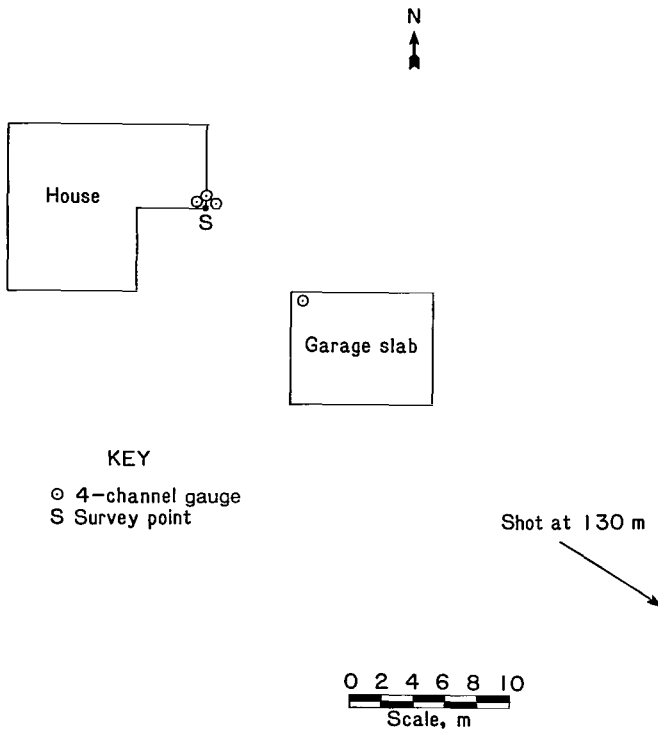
Structure, transducer, and shot orientation for Schnegg house.
